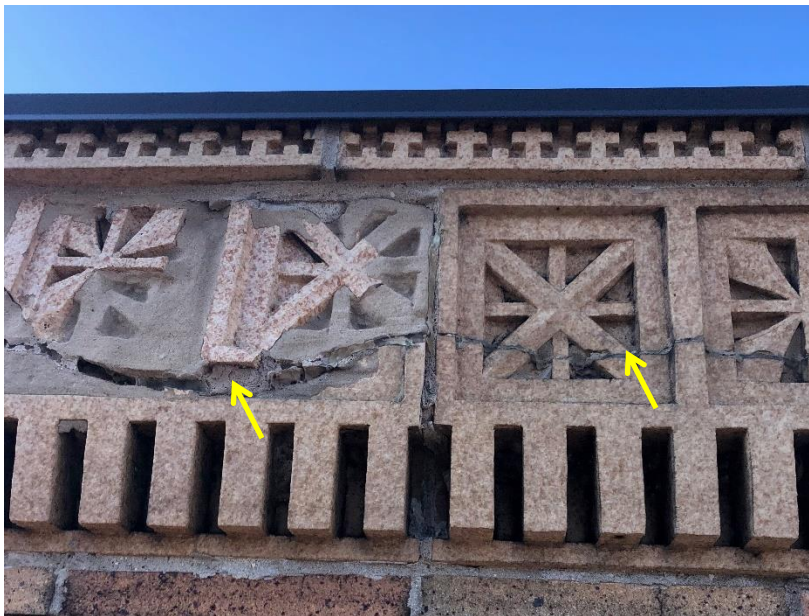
Cracked and previously repaired terra cotta units (photo courtesy of FHP)
